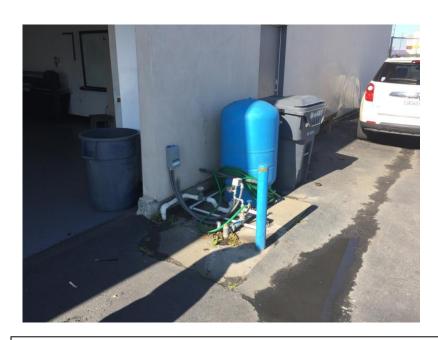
View showing domestic well at 2612 Santa Rosa Avenue
